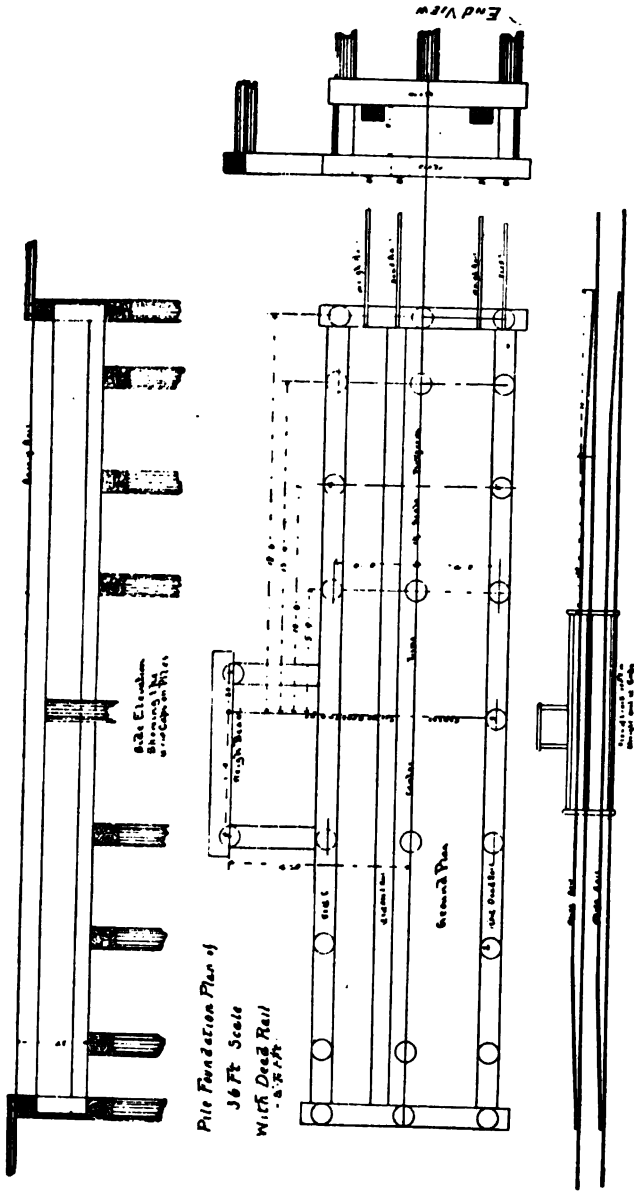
PILE FOUNDATION PLAN OF 36-FOOT SCALE WITH DEAD RAIL.
